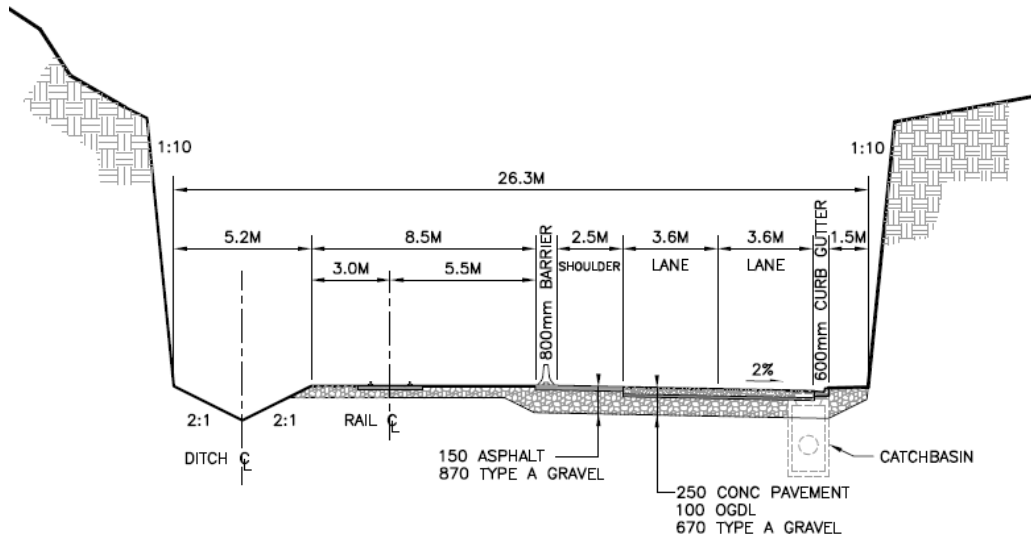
2 Rail lines and a two-lane two-way road with urban drainage
